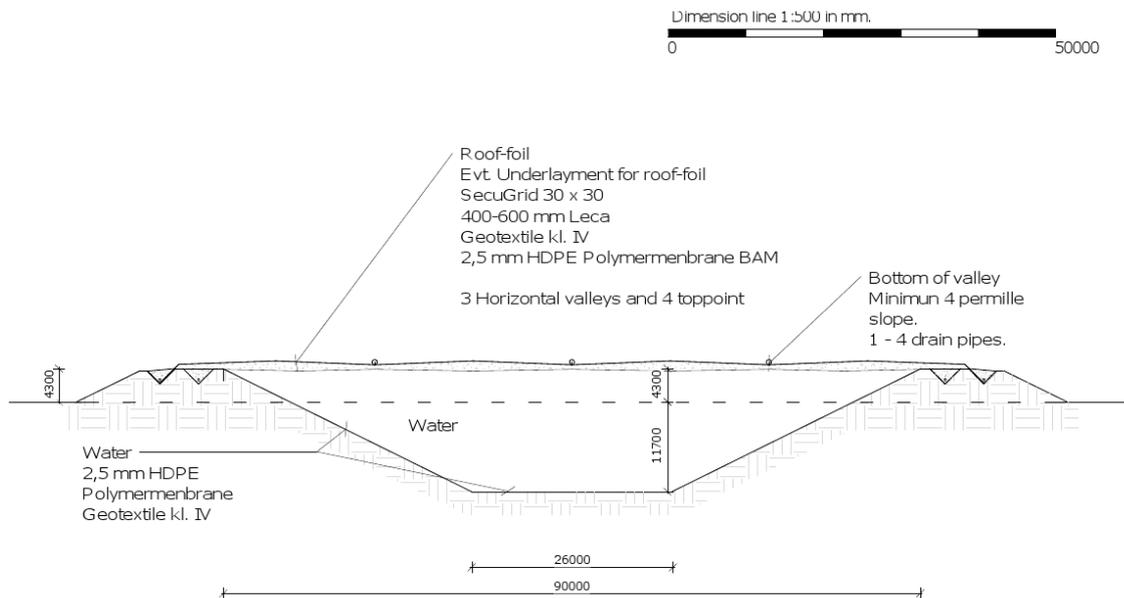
Cross section of the PIT storage construction in Marstal, Dk (75,000 m³) (source: Planenergi)
